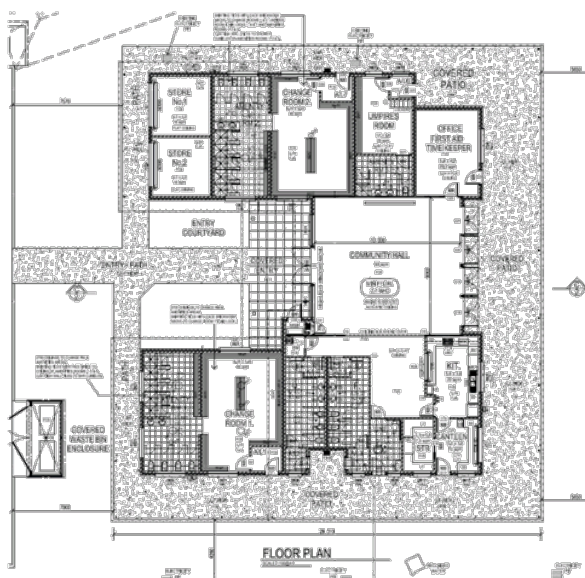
Indicative Combined Sporting Amenities and Community Facility Floor Plan
